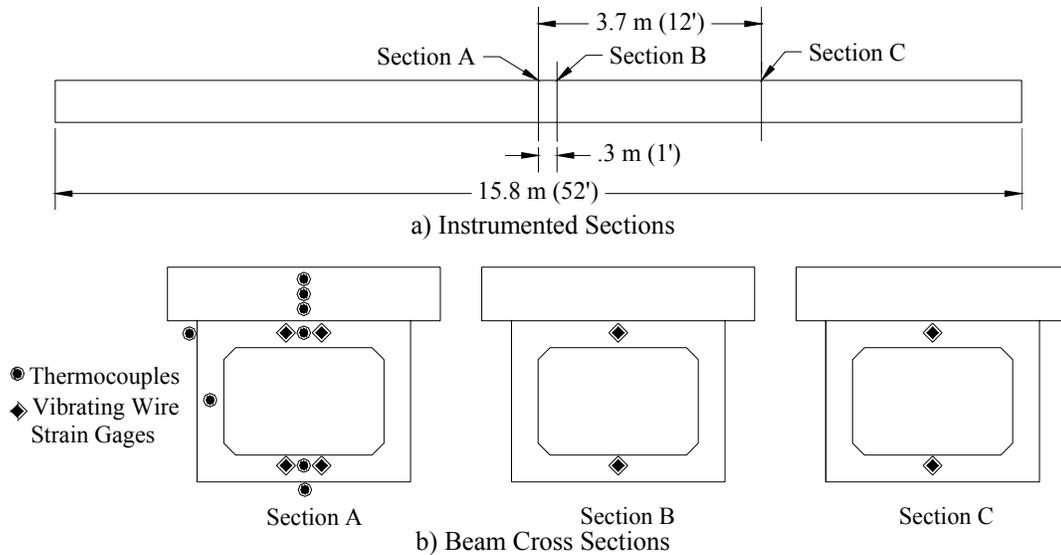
Instrument Layout for Continuous Monitoring Plan
